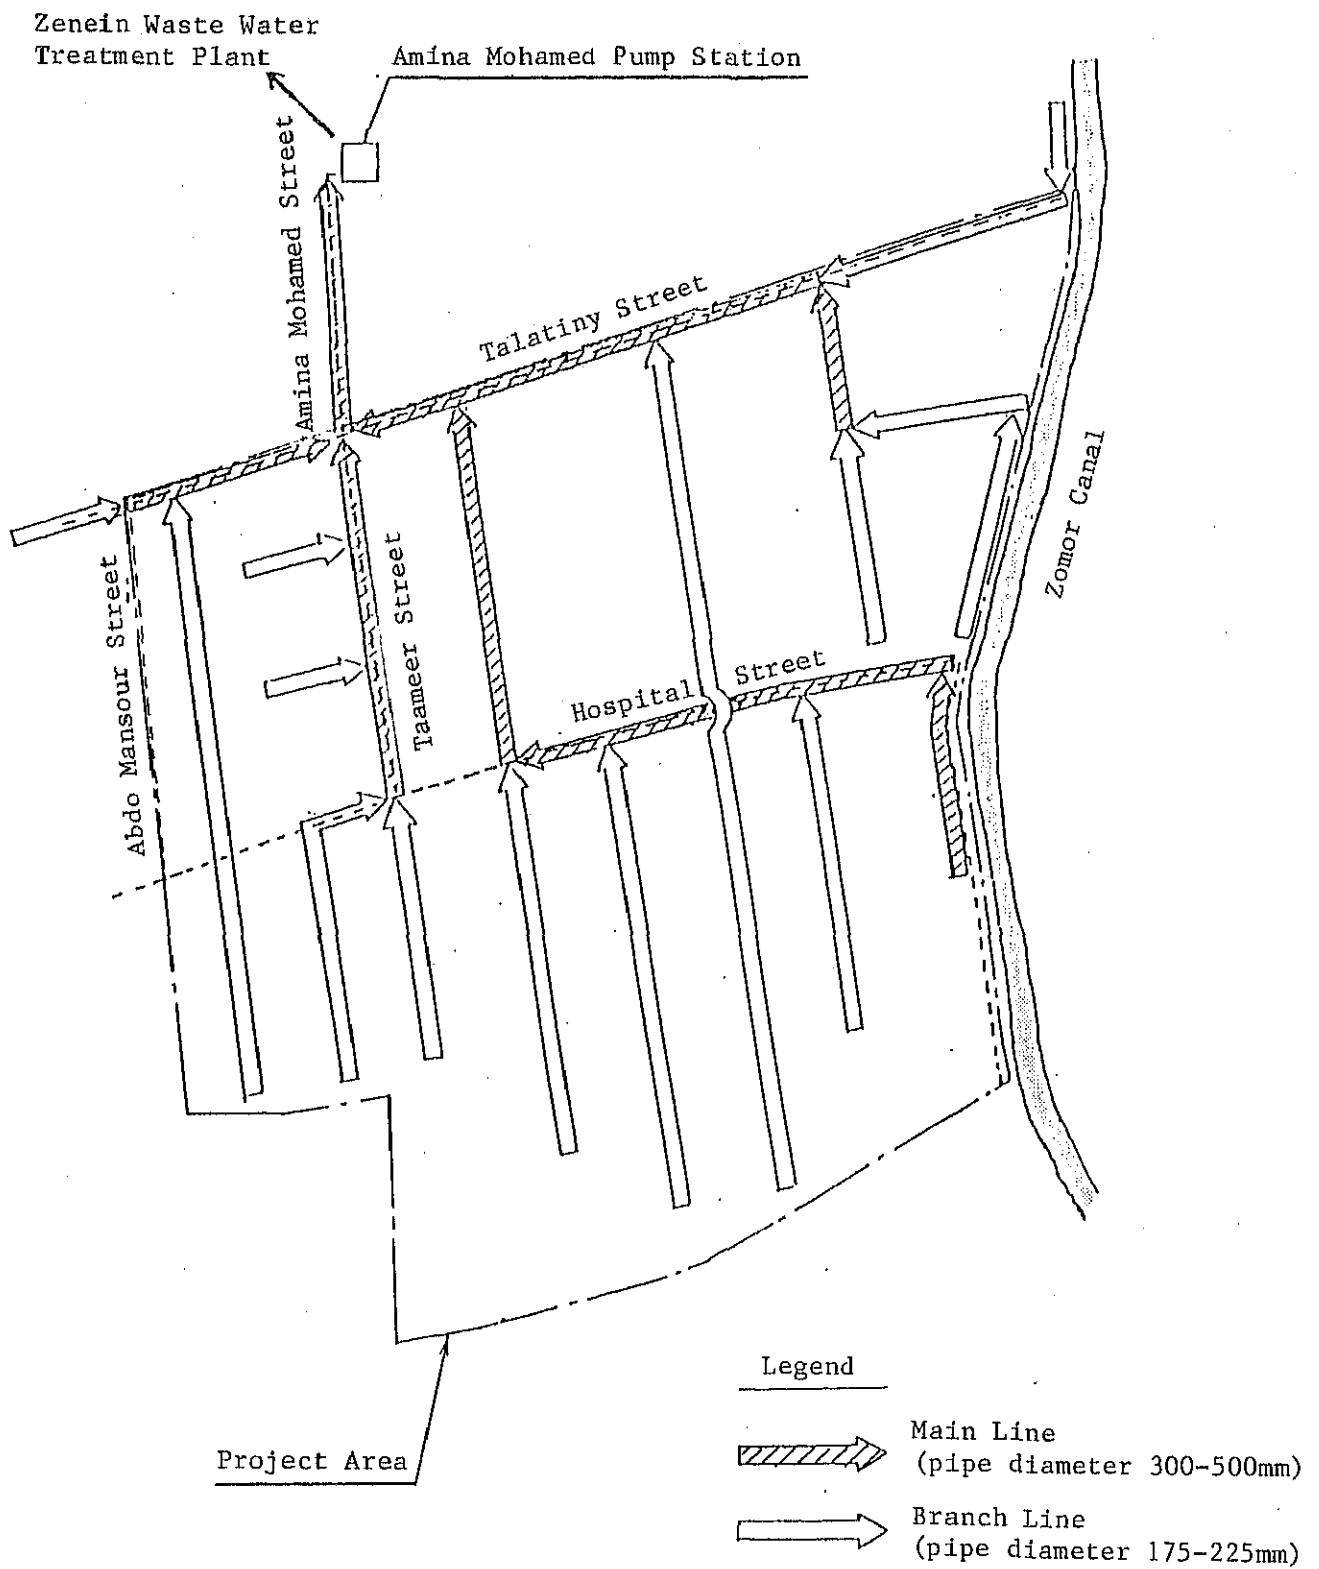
Drainage Route of Existing Sewer Facilities in Omrania West
